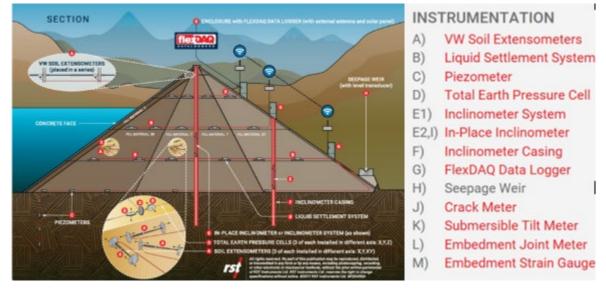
A typical overview of the in-situ dam monitoring systems for a concrete face rockfill dam [18].
